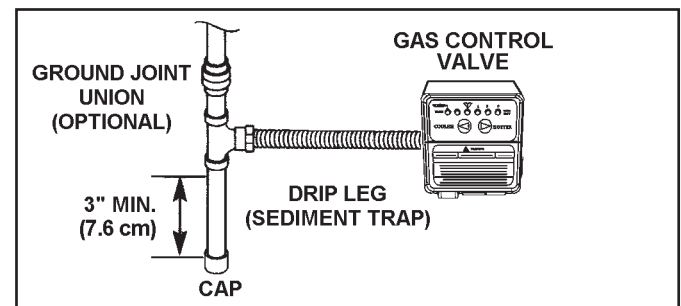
GAS PIPING WITH FLEXIBLE CONNECTOR.
